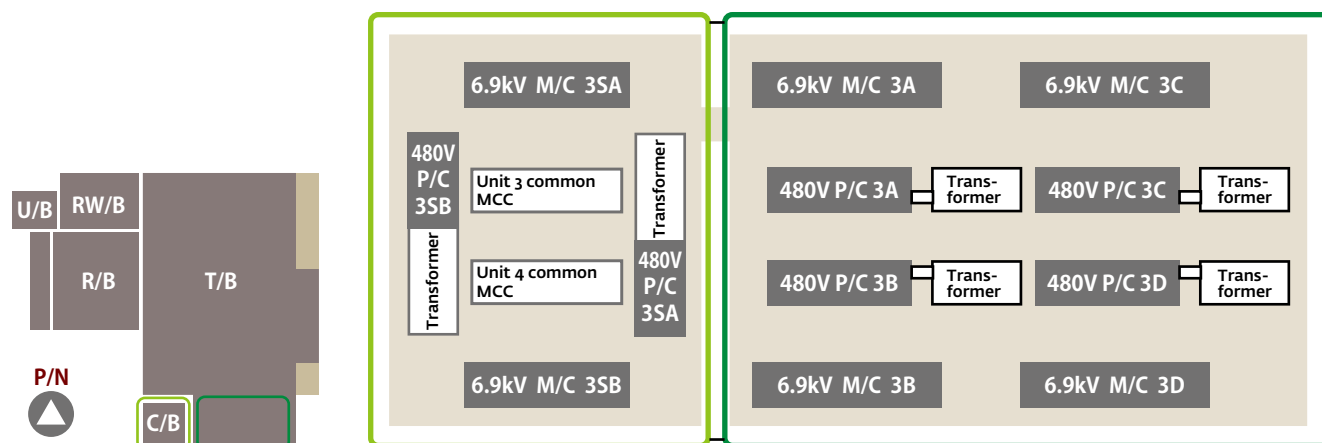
Floor plans of basement floors of turbine building and control building for Unit 3 ^[15]
